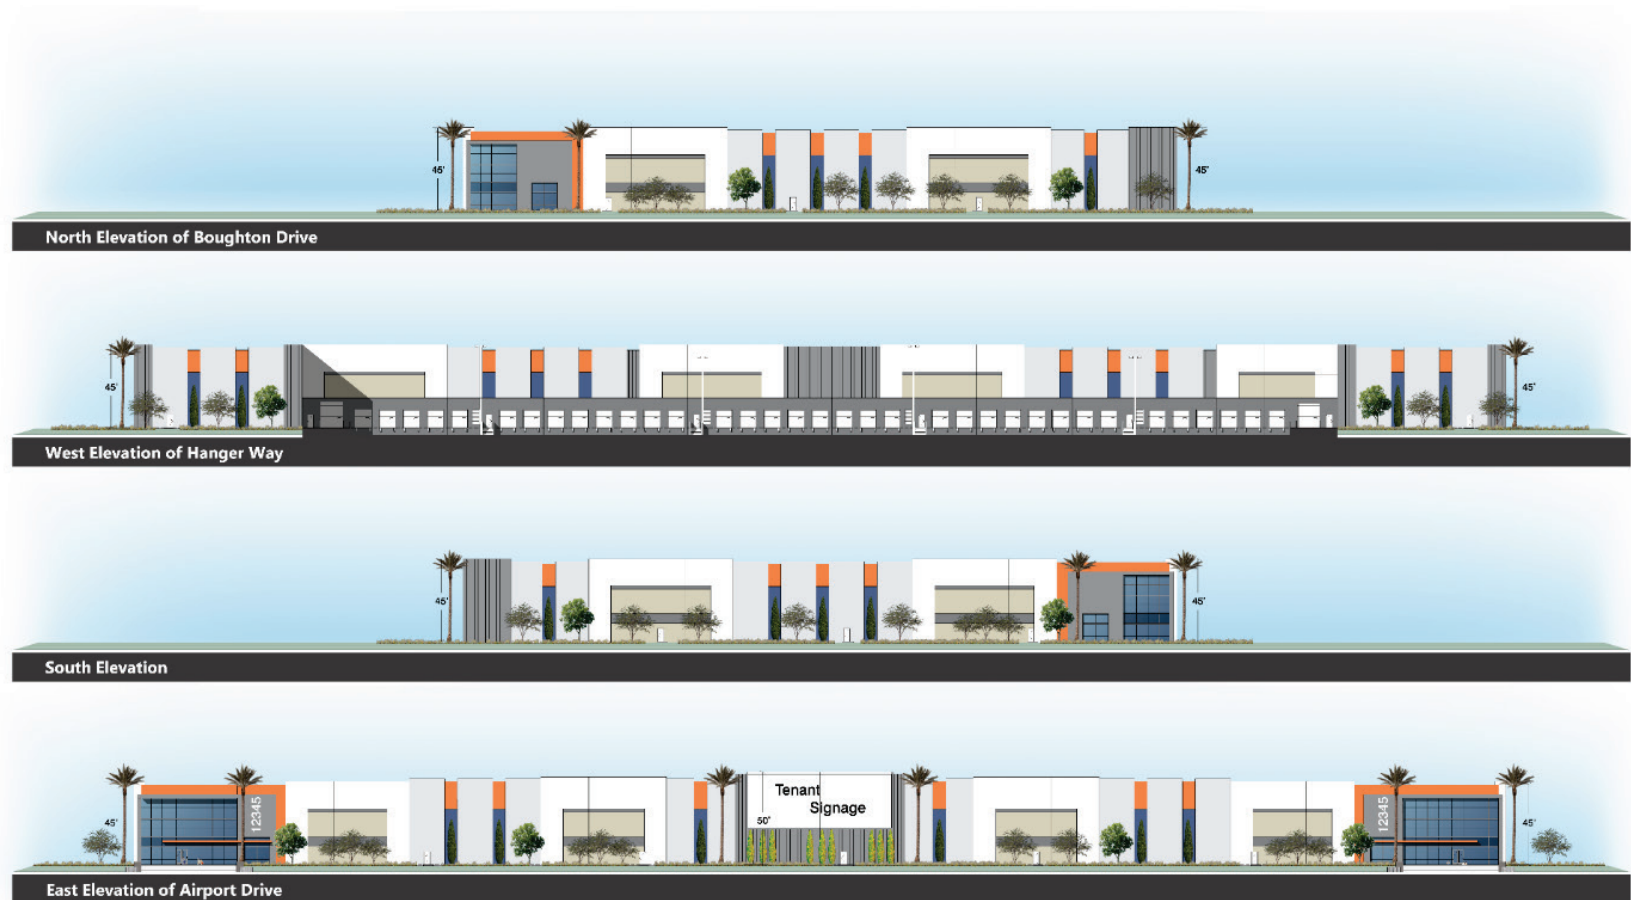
Precise Development Plan - Building 1 Elevations
